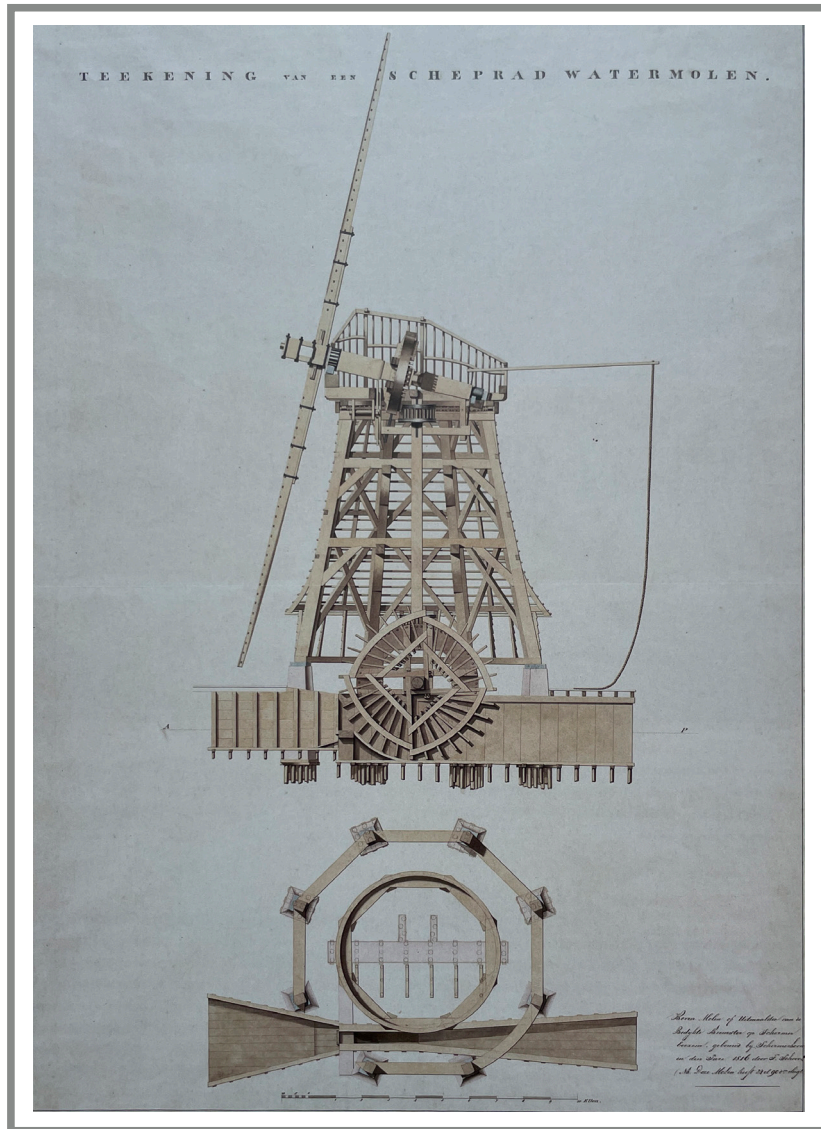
Drawing of a paddle wheel windmill, North Holland Archive, Collection Technical Drawings)
